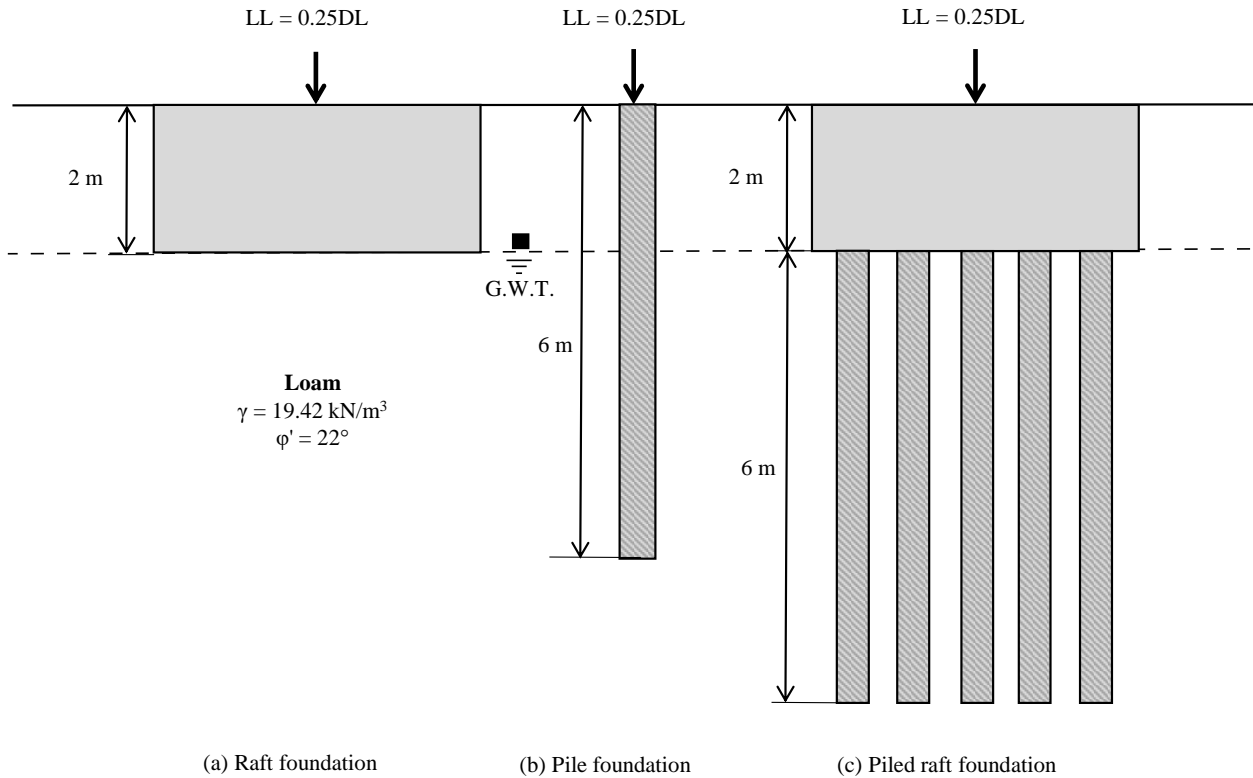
Idealized soil profile and designed raft, pile, and piled raft foundations
